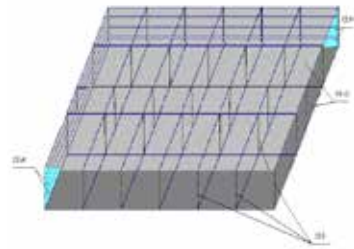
Calculated model of a flat lightweight reinforced concrete precast-monolithic slab with voids formed by plastic spheres
